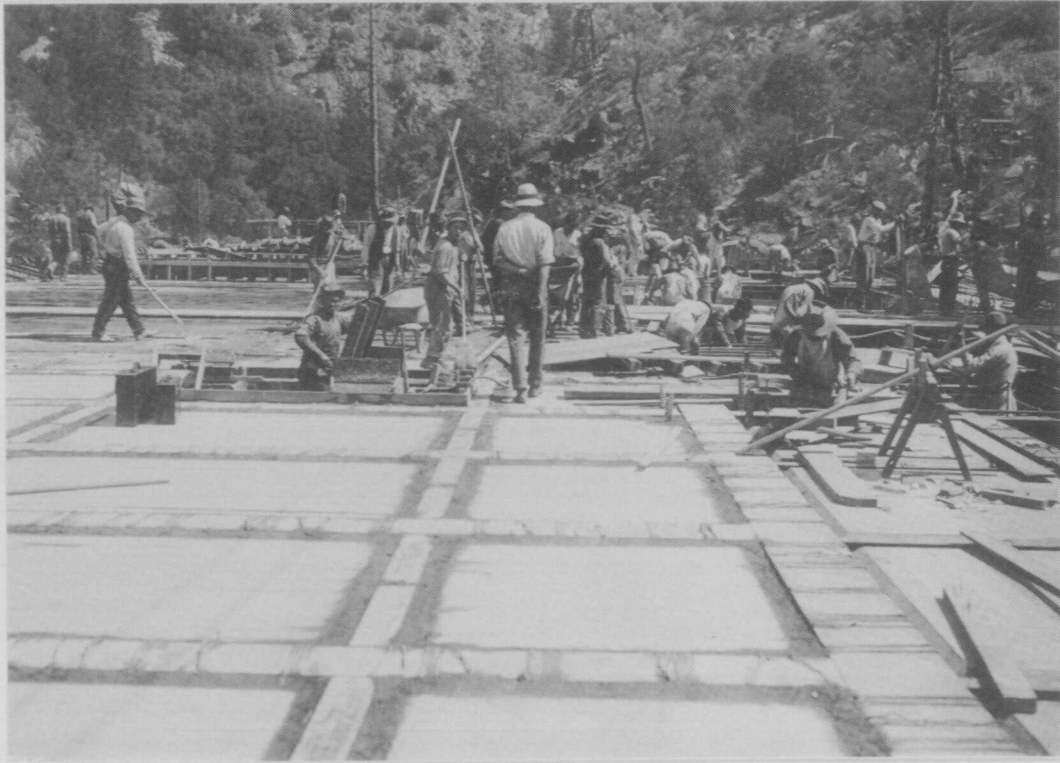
Pouring an upper-story floor at Powerhouse No. 2 in September 1913 (SCE var. [b]:Album 1, No. 593).
